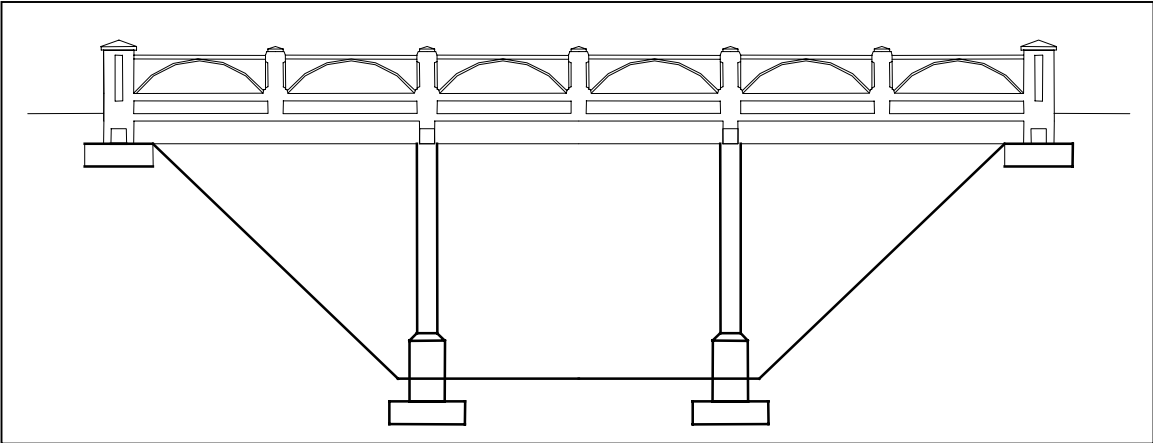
Elevation of Horsetail Creek Bridge (No. 04543)
